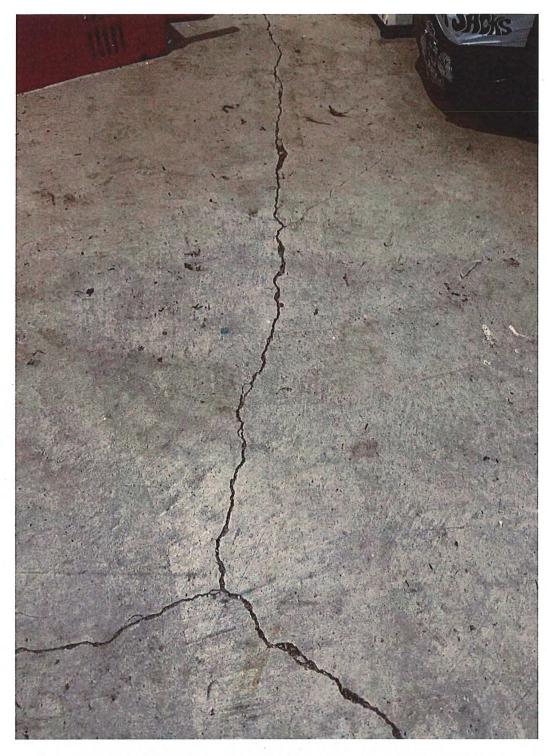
View of concrete floor inside the garage shown on photos 1-3 showing existing damage to the concrete floor from the root system of Tree 6
